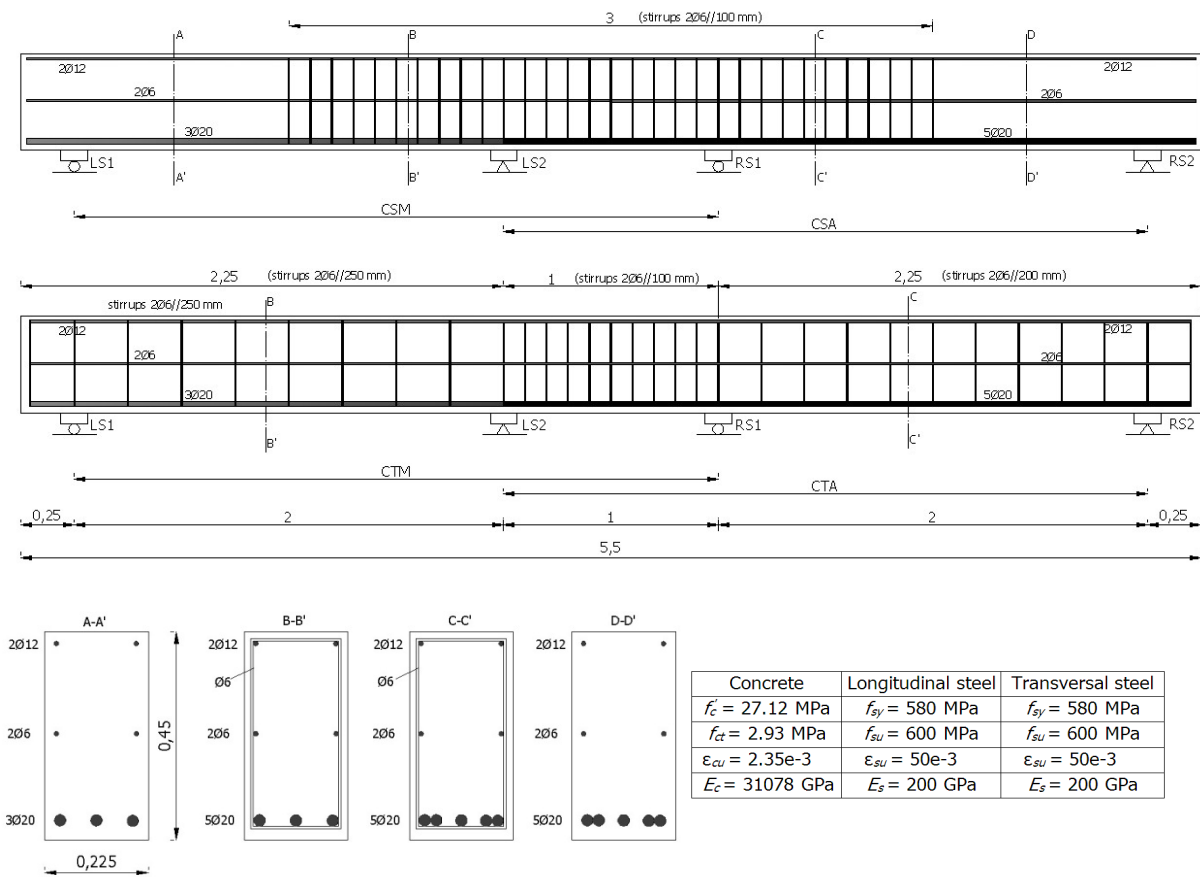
Geometry, reinforcement and material properties of the beams tested at UPC
